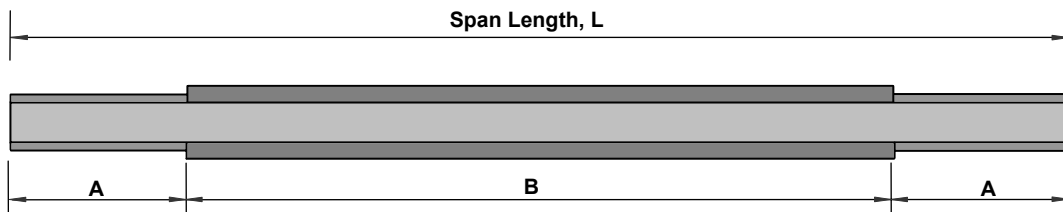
Hypothetical girder elevation for girder configurations found in Table 6.1
